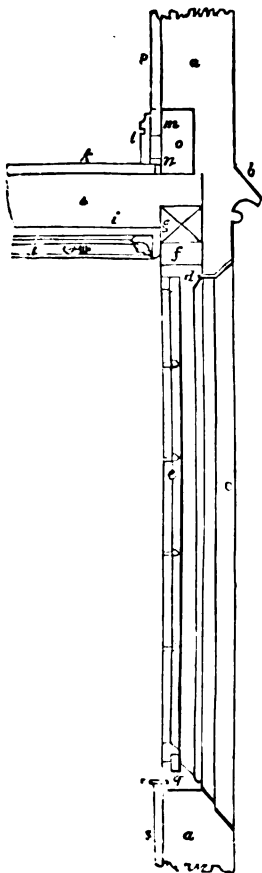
is a section showing the construction of the embattlements, in which we have the wall of the ground floor a brick and a half thick, *t*; the wall of the bed-room floor one brick thick, *u*;
